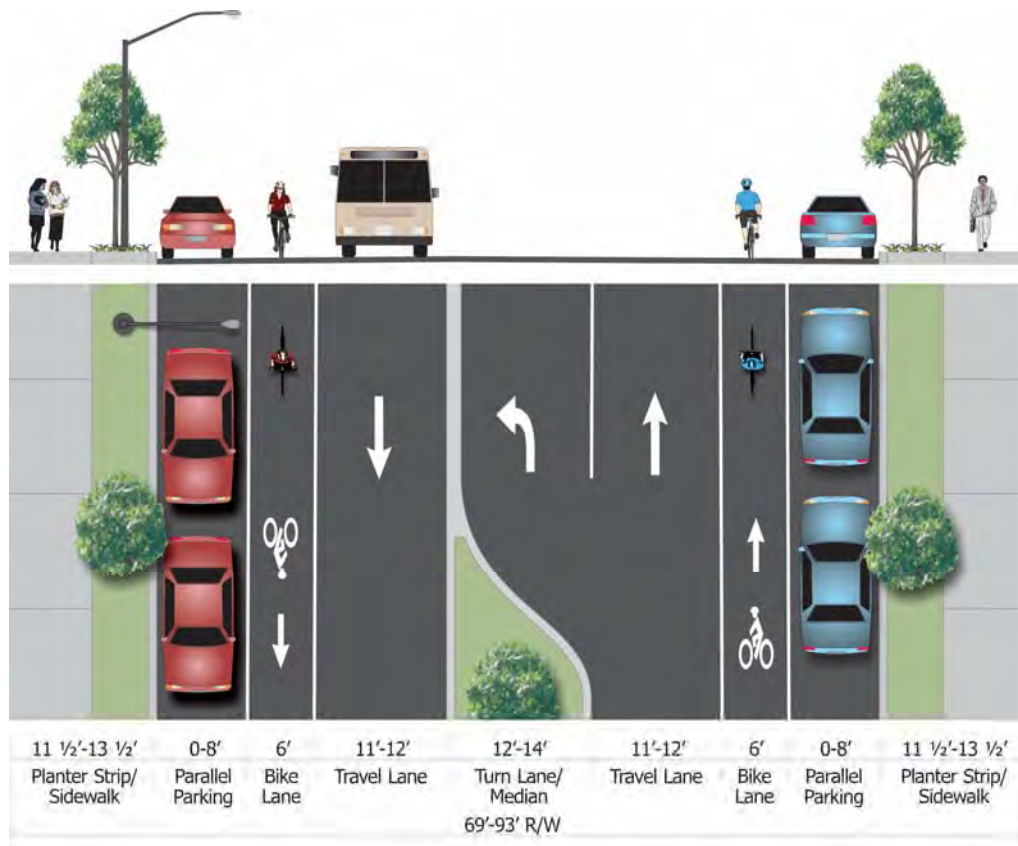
MINOR ARTERIAL CROSS-SECTION
